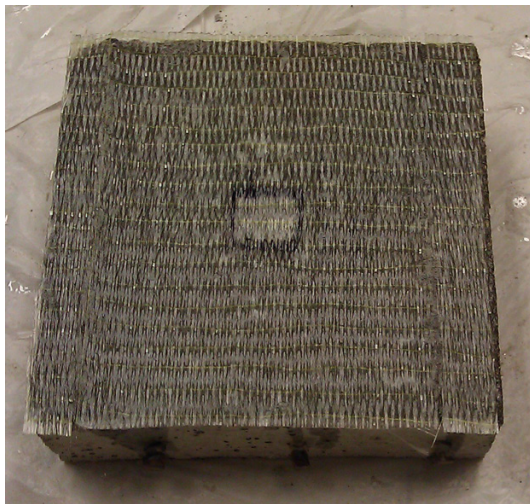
FRPP1, FRP-bonded reinforced concrete panel
